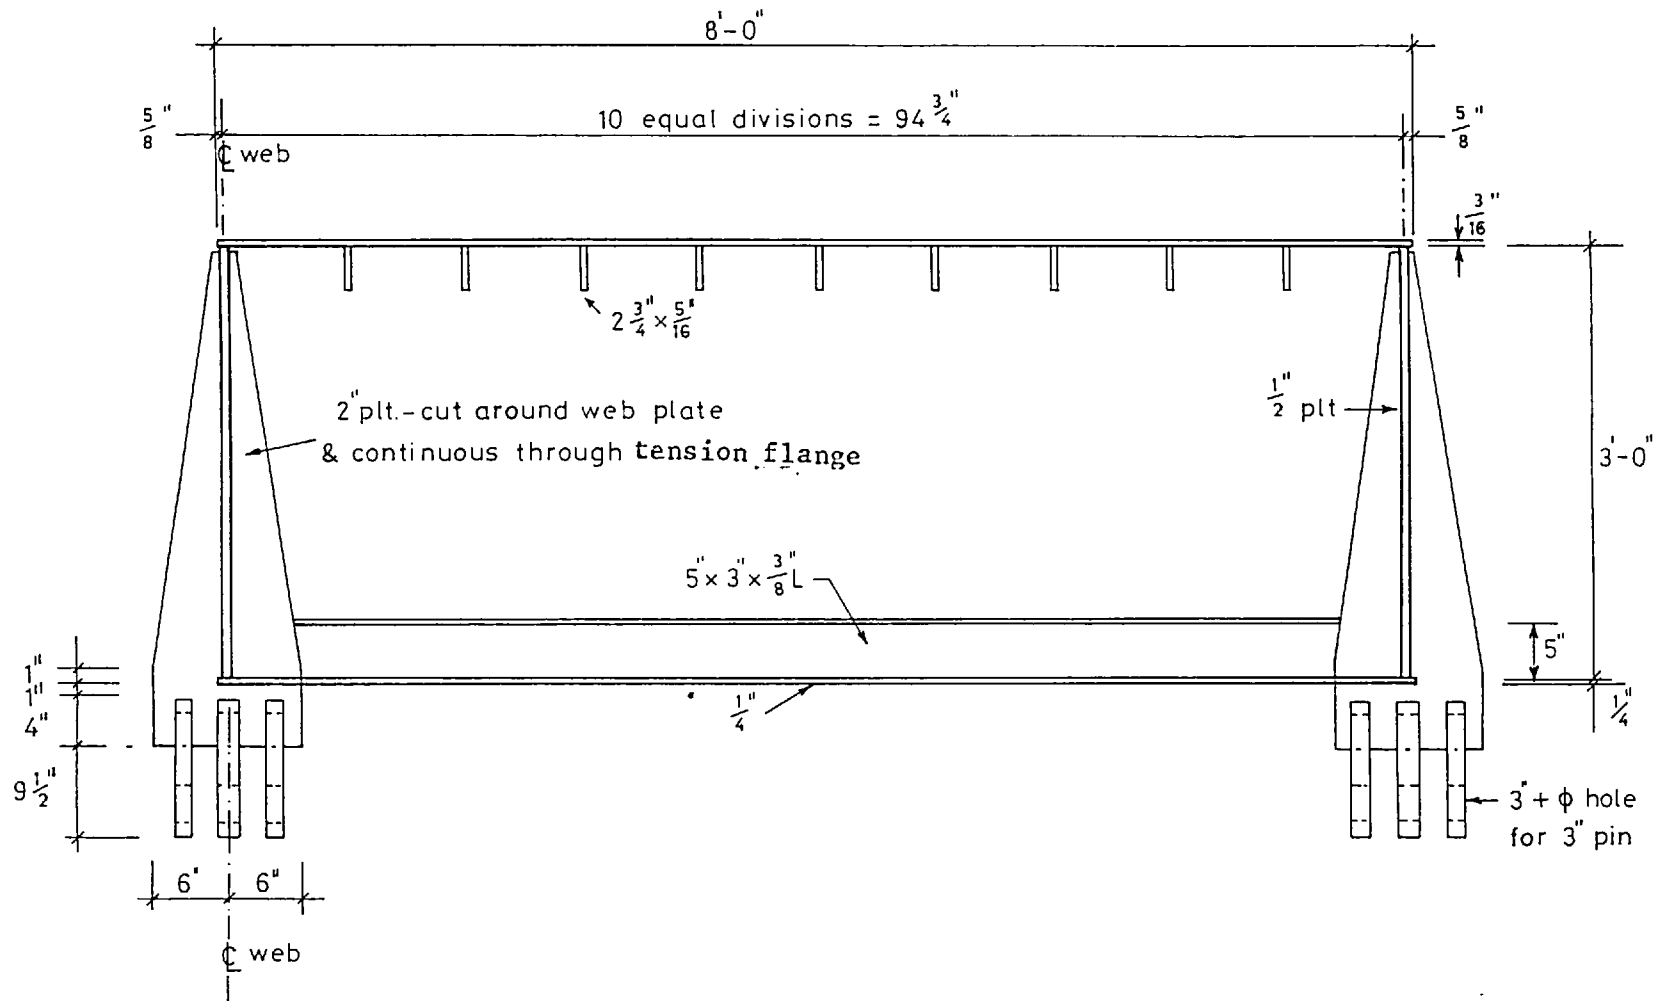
Model 9: Cross-section and Details of Loading Lugs
